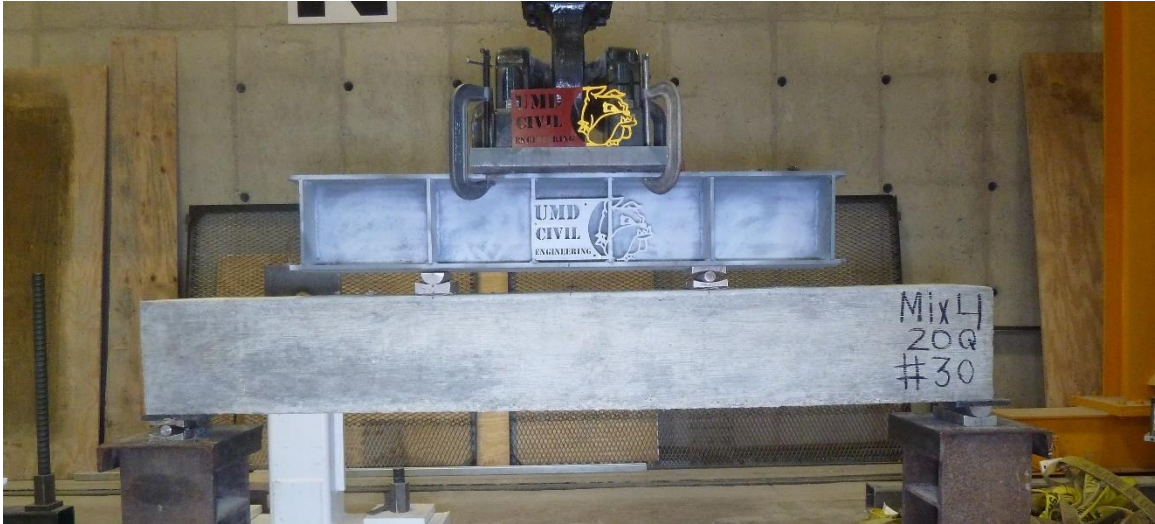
Mixture 4 (20Q) beam #30: concrete beam before testing.
